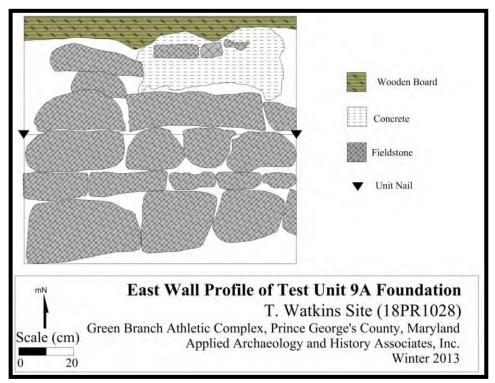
East Wall Profile of Test Unit 9A - Foundation.
